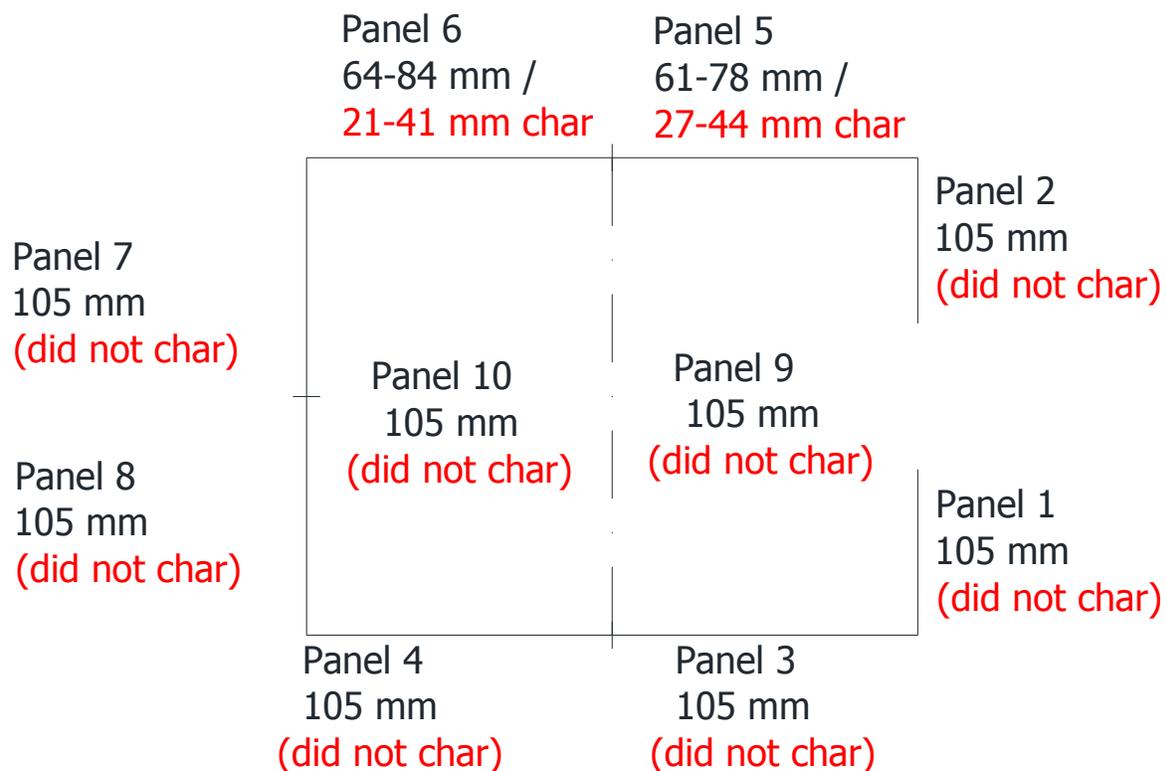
Plan view sketch of remaining cross-section thickness of CLT wall and ceiling panels after Test 3
